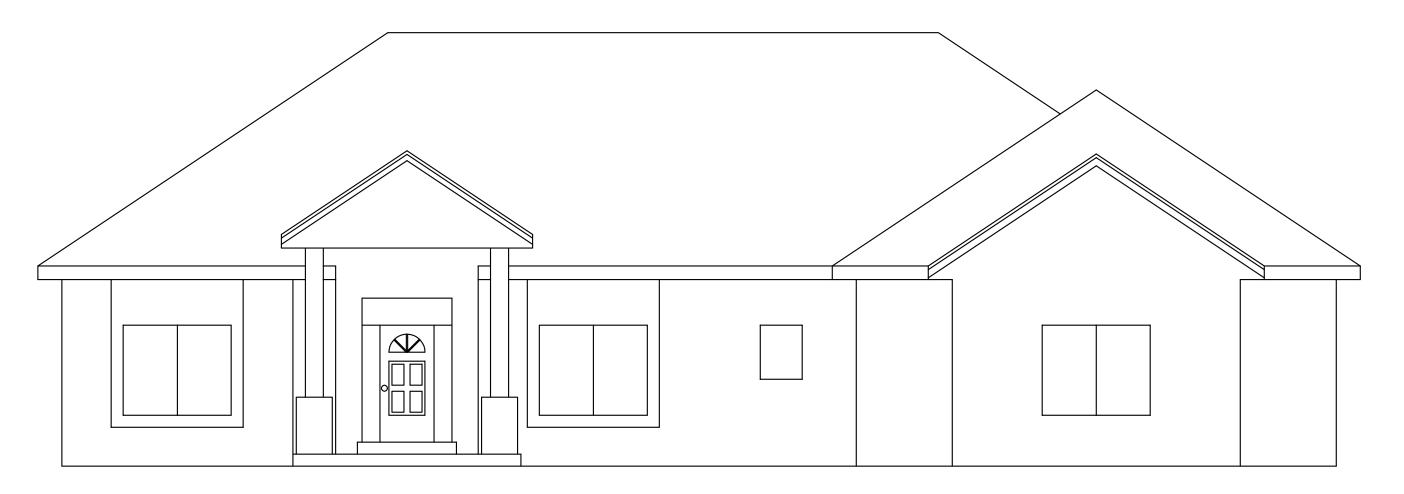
Exhibit A – Survey/Site Plan Exhibit B – Proposed Building Elevations
